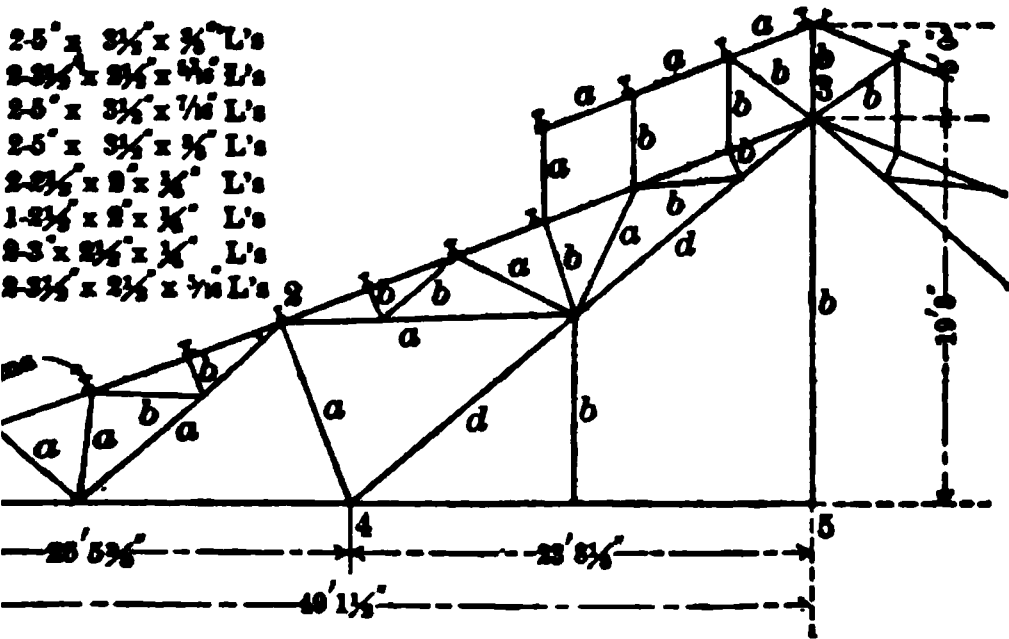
Car-barn, Newark, N. J. Span Ninety-eight Feet, Three Inches.
